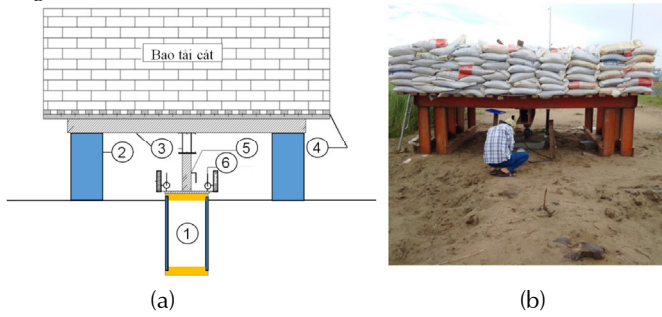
Schematic arrangement of testing (a) and photo at site (b). 1: sewer, 2: supports, 3: main girder, 4: universal beams, 5: hydraulic jacks, 6 : dial gages.
